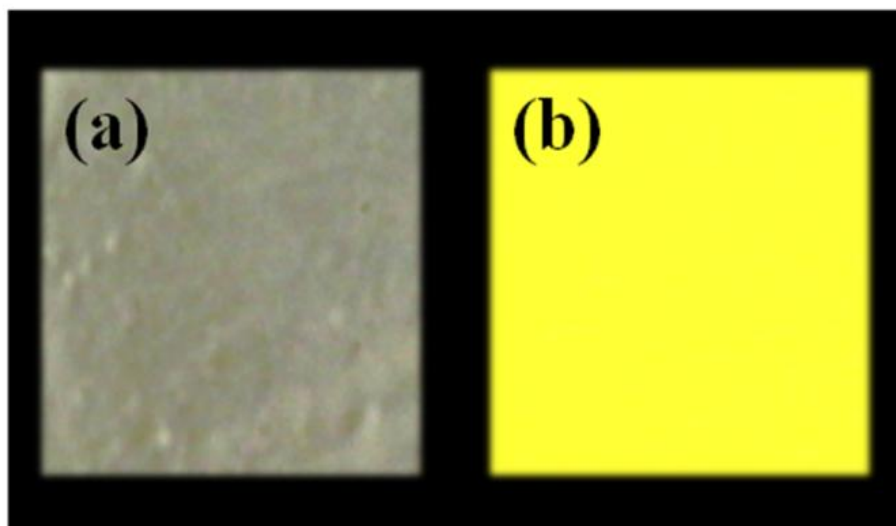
Photographs of bare concrete and pigment coated concrete.
